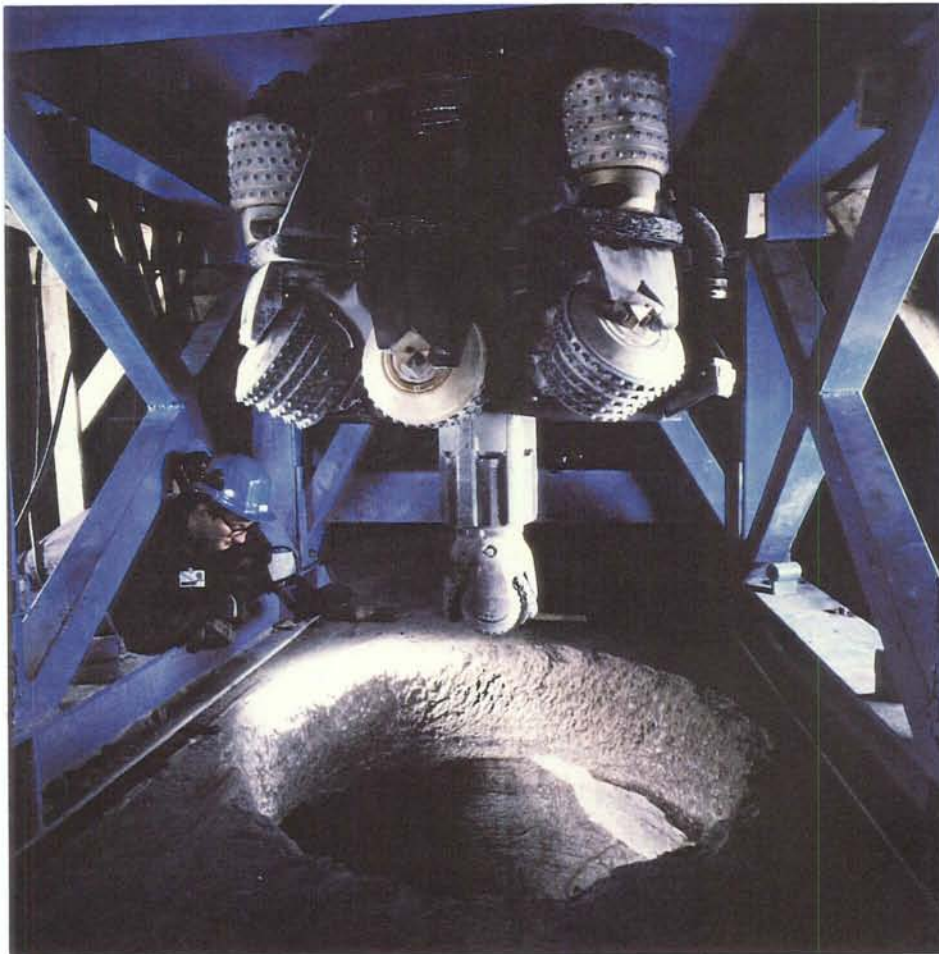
Cutter head under the base frame and above a bored hole.
